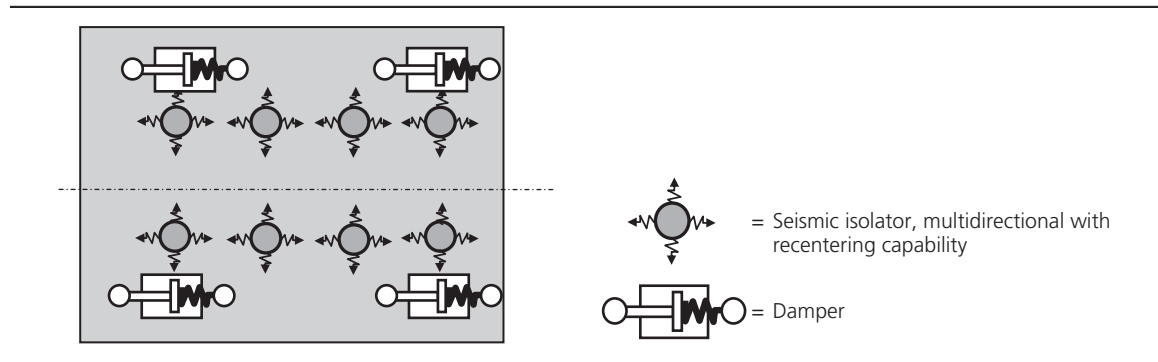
Bridge deck for a seismic isolator-and-damper arrangement
